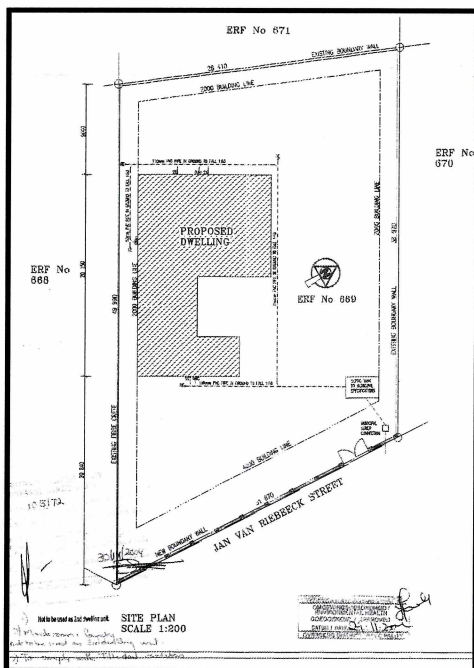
Extract from Latest Approved Building Plans (November, 2004)
